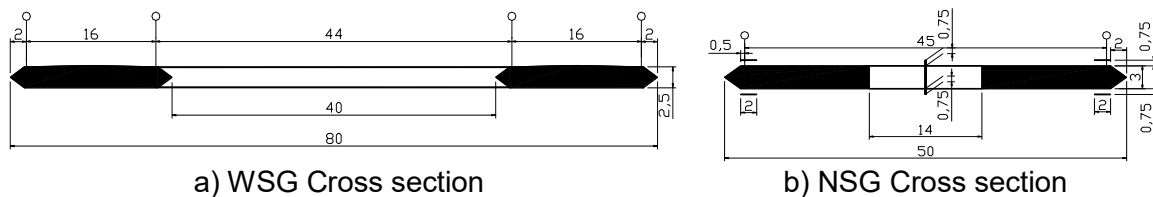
Stiffening girders of Taiwan Strait Bridge (Unit: m)
